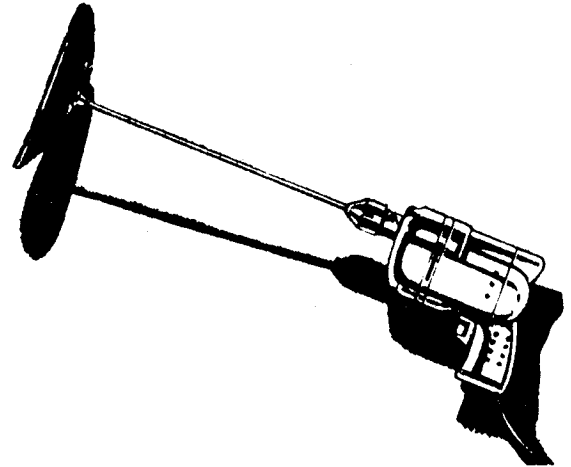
A 1,750 rpm electric drill with a rubber disc is recommended for mixing HYDROPERM.
